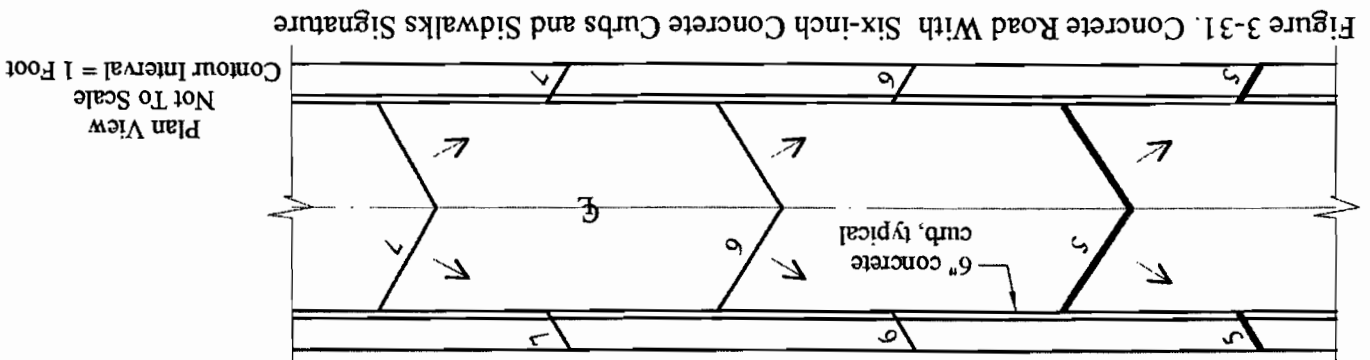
Concrete Road With Six-inch Concrete Curbs and Sidewalks Signature
